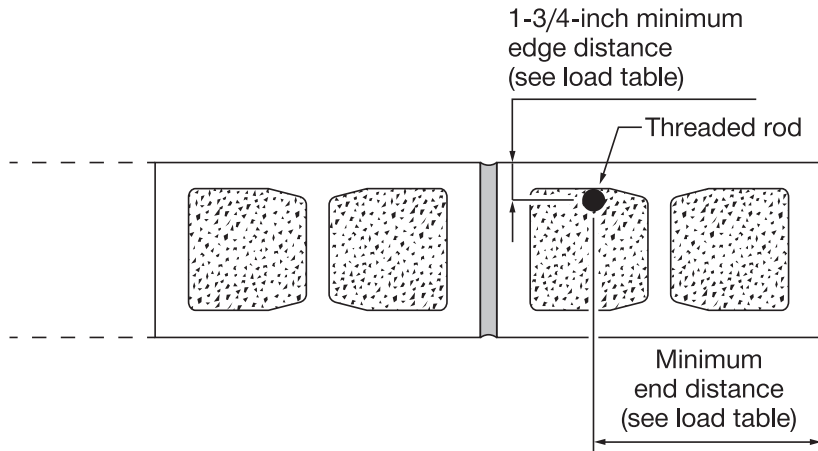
Allowable anchor installation locations in the top of grout-filled masonry construction
